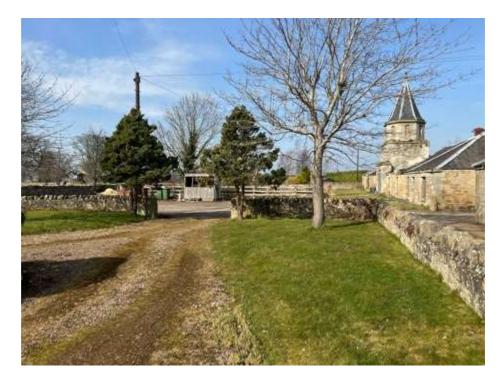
existing stone wall to north boundary and existing gate from farm entrance road.
